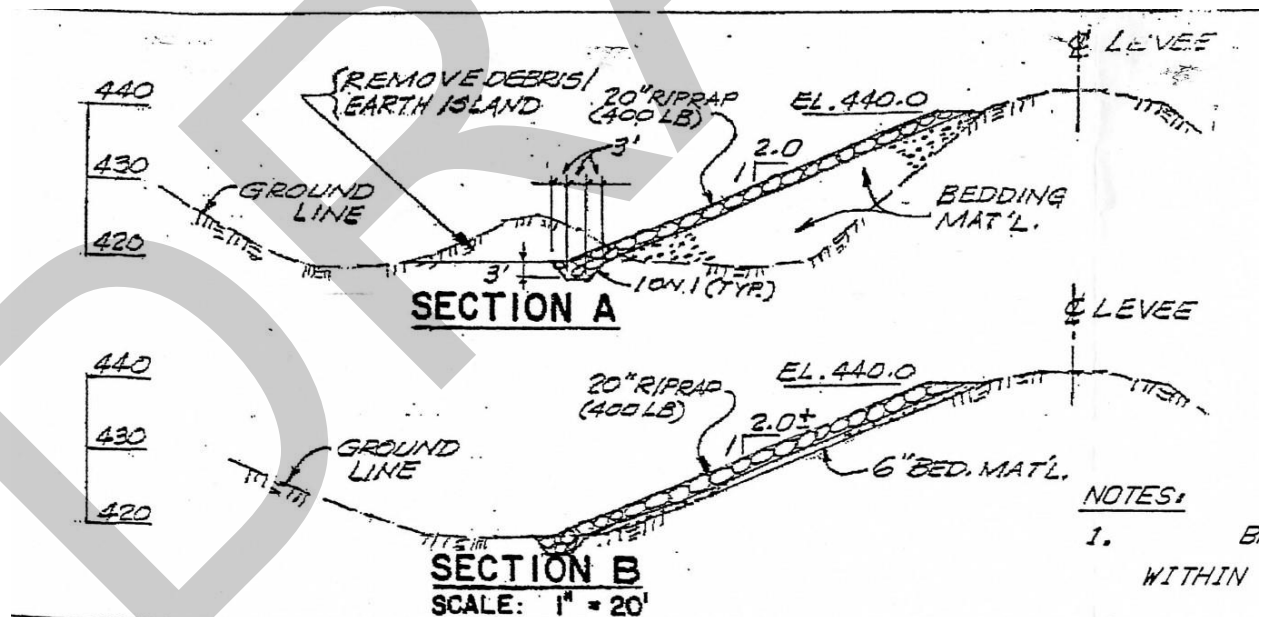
Cross Sections from 2002 Revetment Project at the O'Fallon, IL Wastewater Treatment Plant
